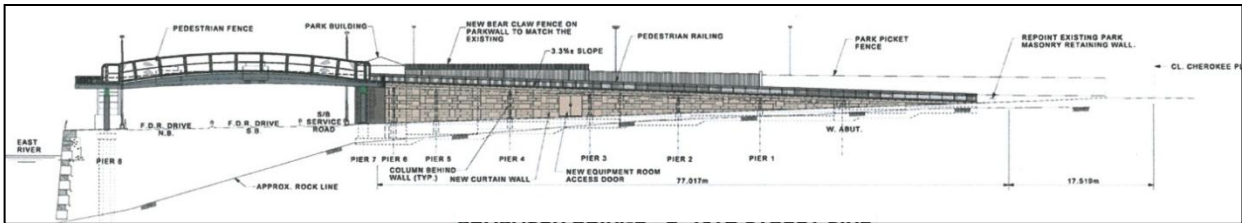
Rendering of the East 78<sup>th</sup> Street ramp and John Jay Park wall.
